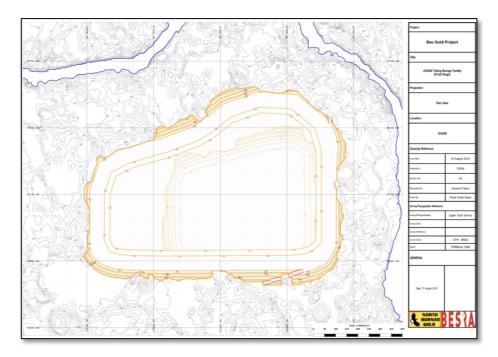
Plan View of Stage 2 of TSF at Jugan
